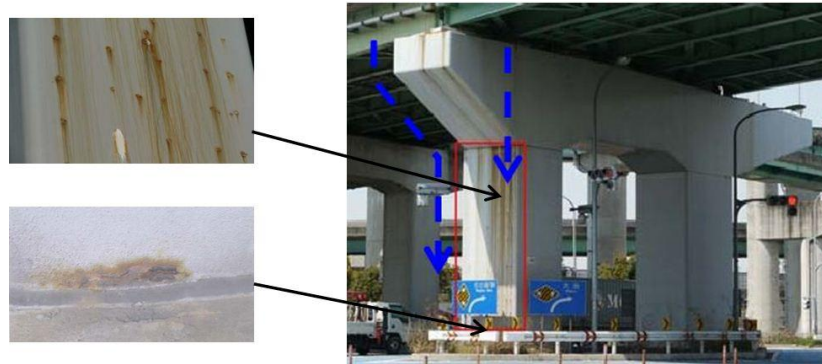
Corrosion phenomenon observed in reinforced concrete pier wrapped with steel plates
